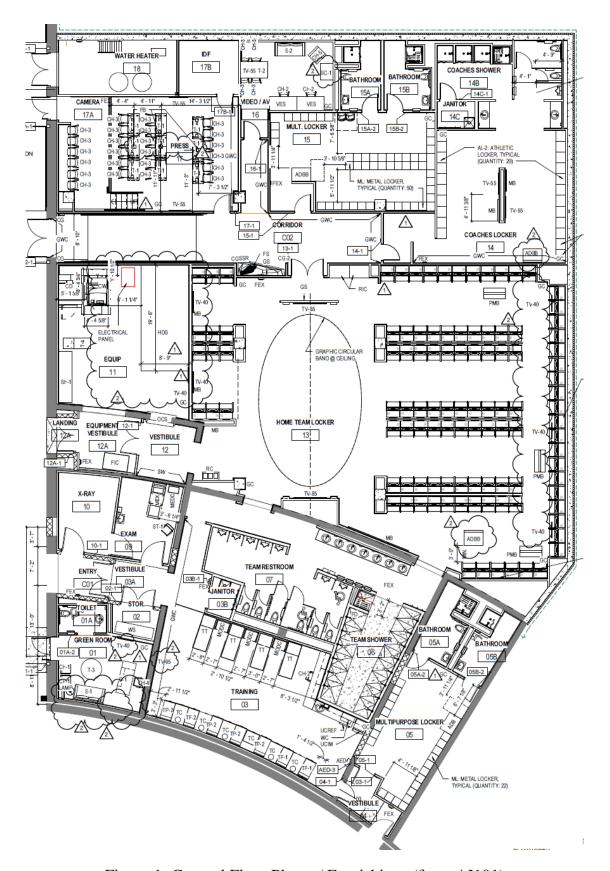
General Floor Plan w/ Furnishings (from AI101)
